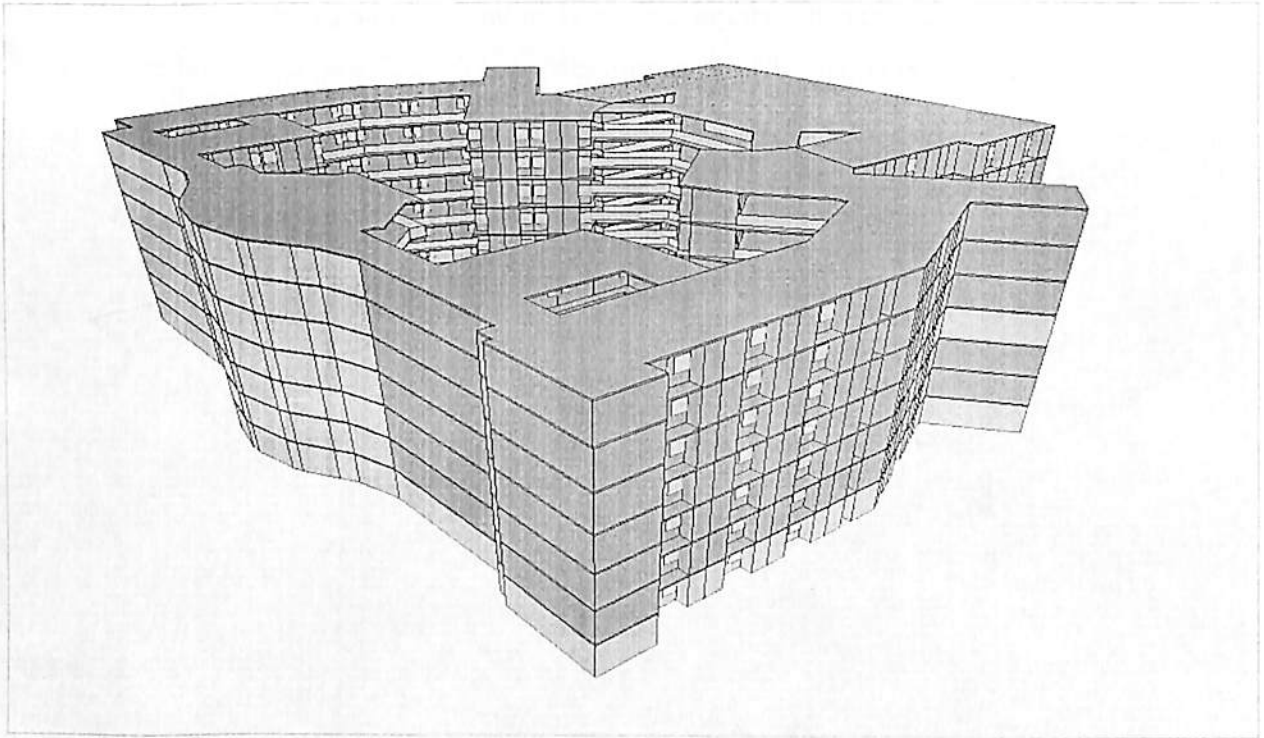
IIT Hostel Block model layout in 3D layout in an orientation
